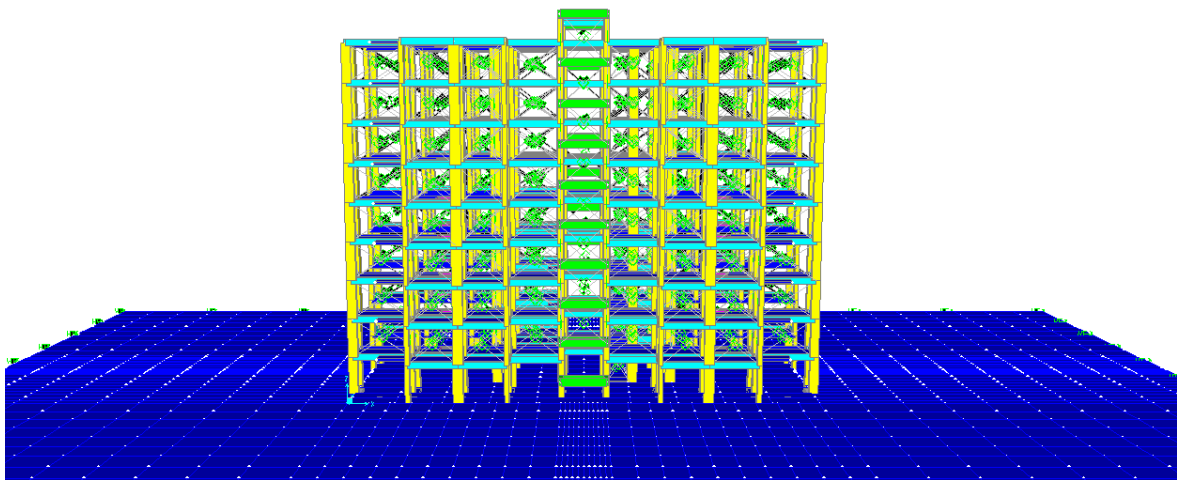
Side view of the building with ground floor as soft storey with infill walls
